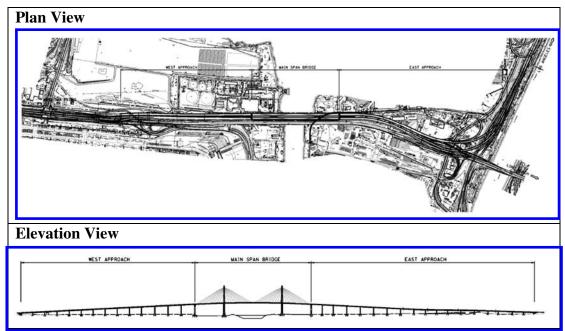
Gerald Desmond Replacement Project plan and elevation view.
